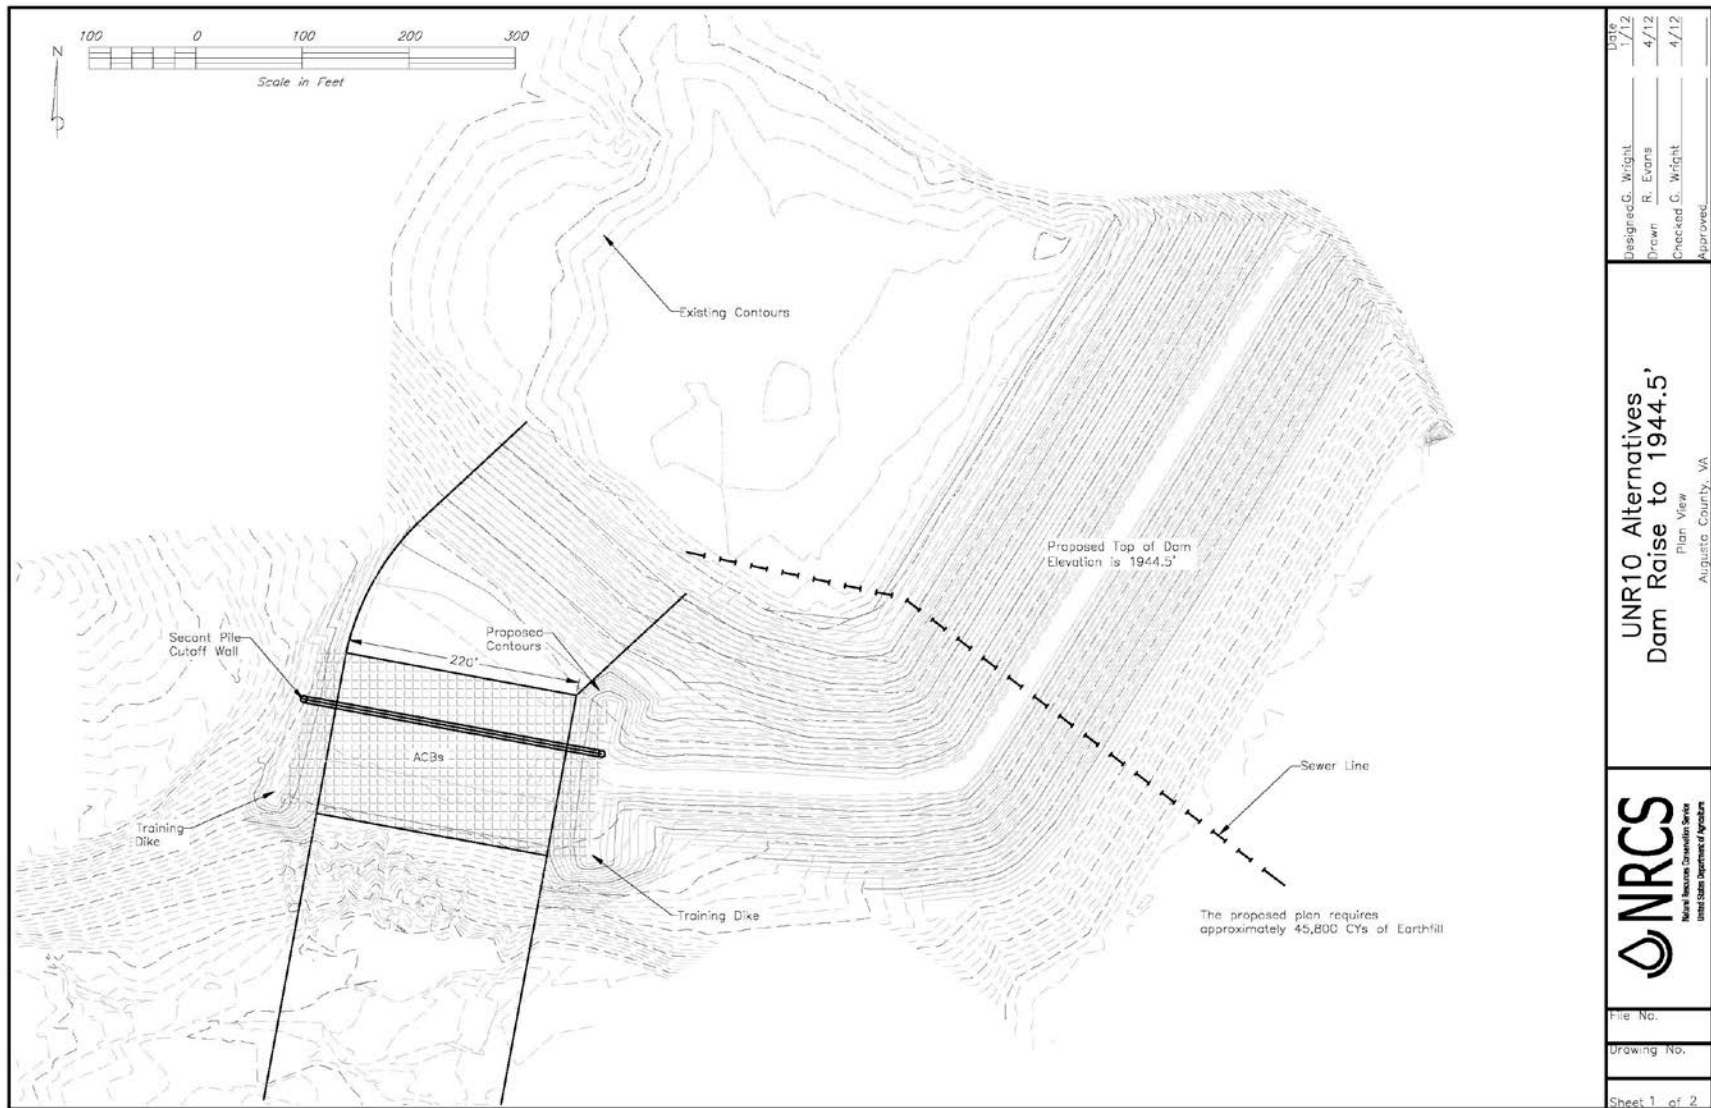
Plan view of site with a secant pile wall, ACB armor, and earthfill for the dam raise (Preferred Alternative).
